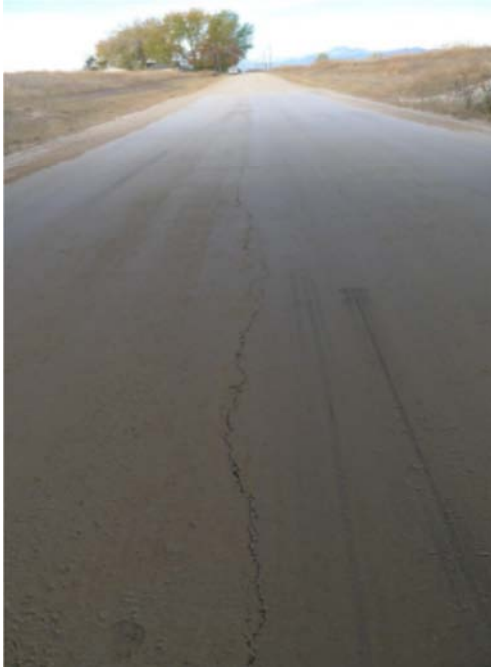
The longitudinal crack on the pavement at WCR 28
